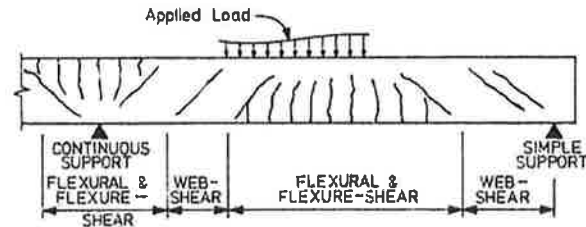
TYPES OF CRACKING IN CONCRETE BEAMS
